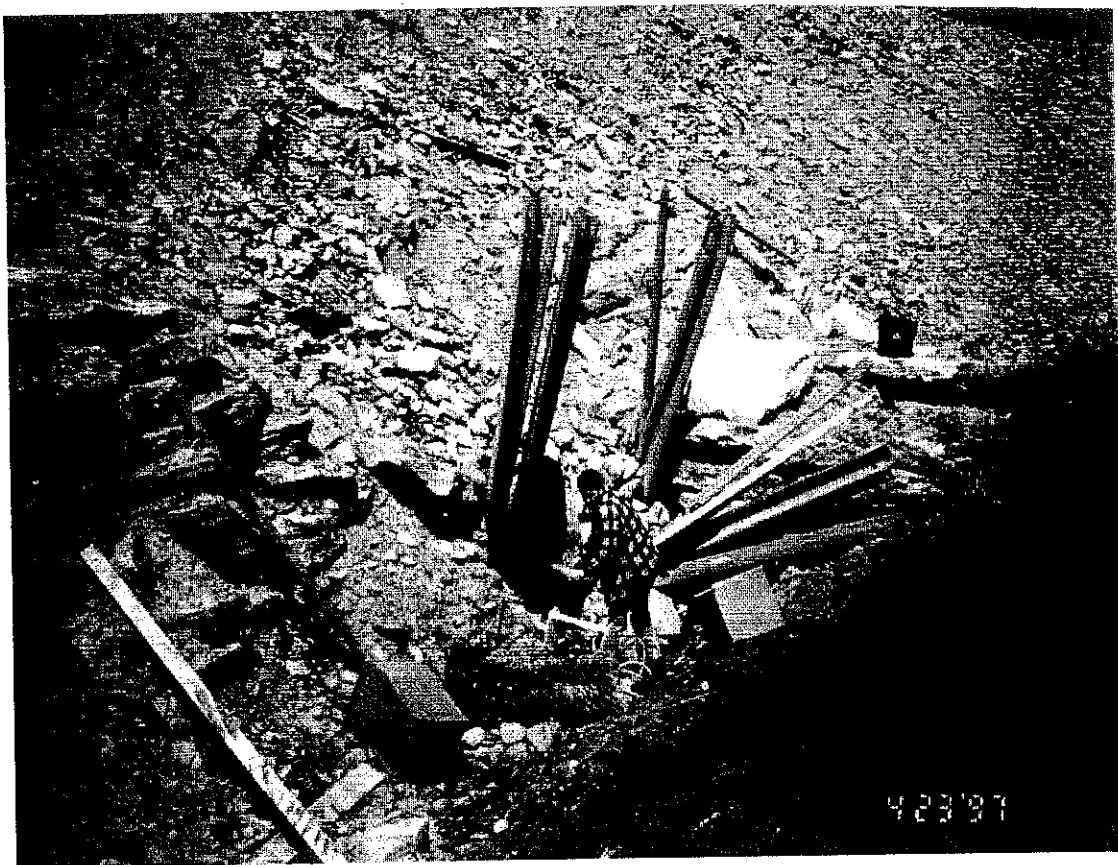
Photo showing remainder of temporary retaining structure which damaged a portion of the culvert.
